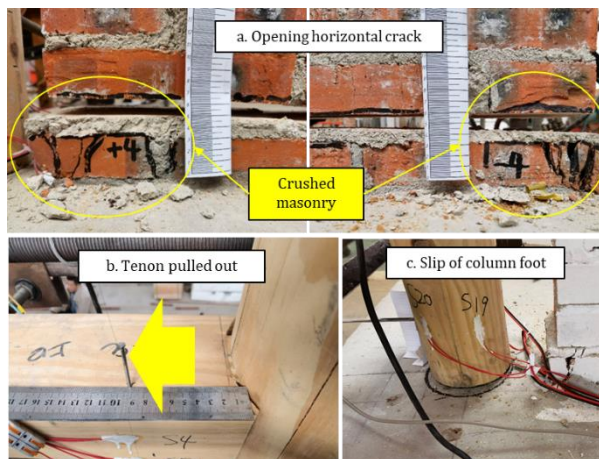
Experimental phenomena of the wall with column foot decay (specimen F2a)
